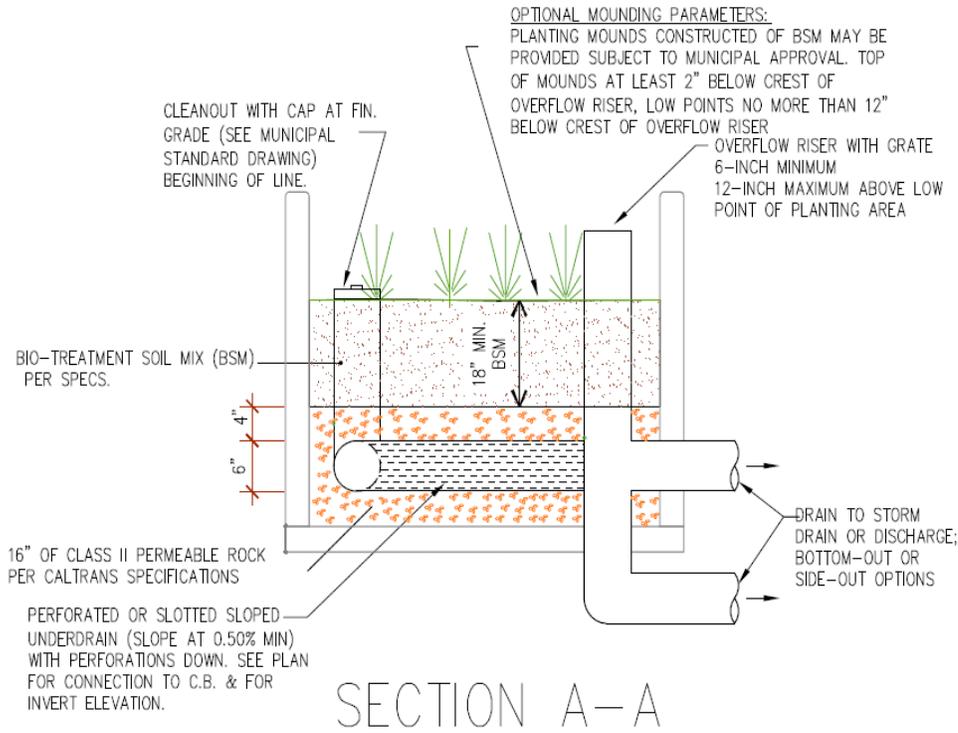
Cross section A-A of flow-through planter, shows side view of underdrain (Not to Scale)
